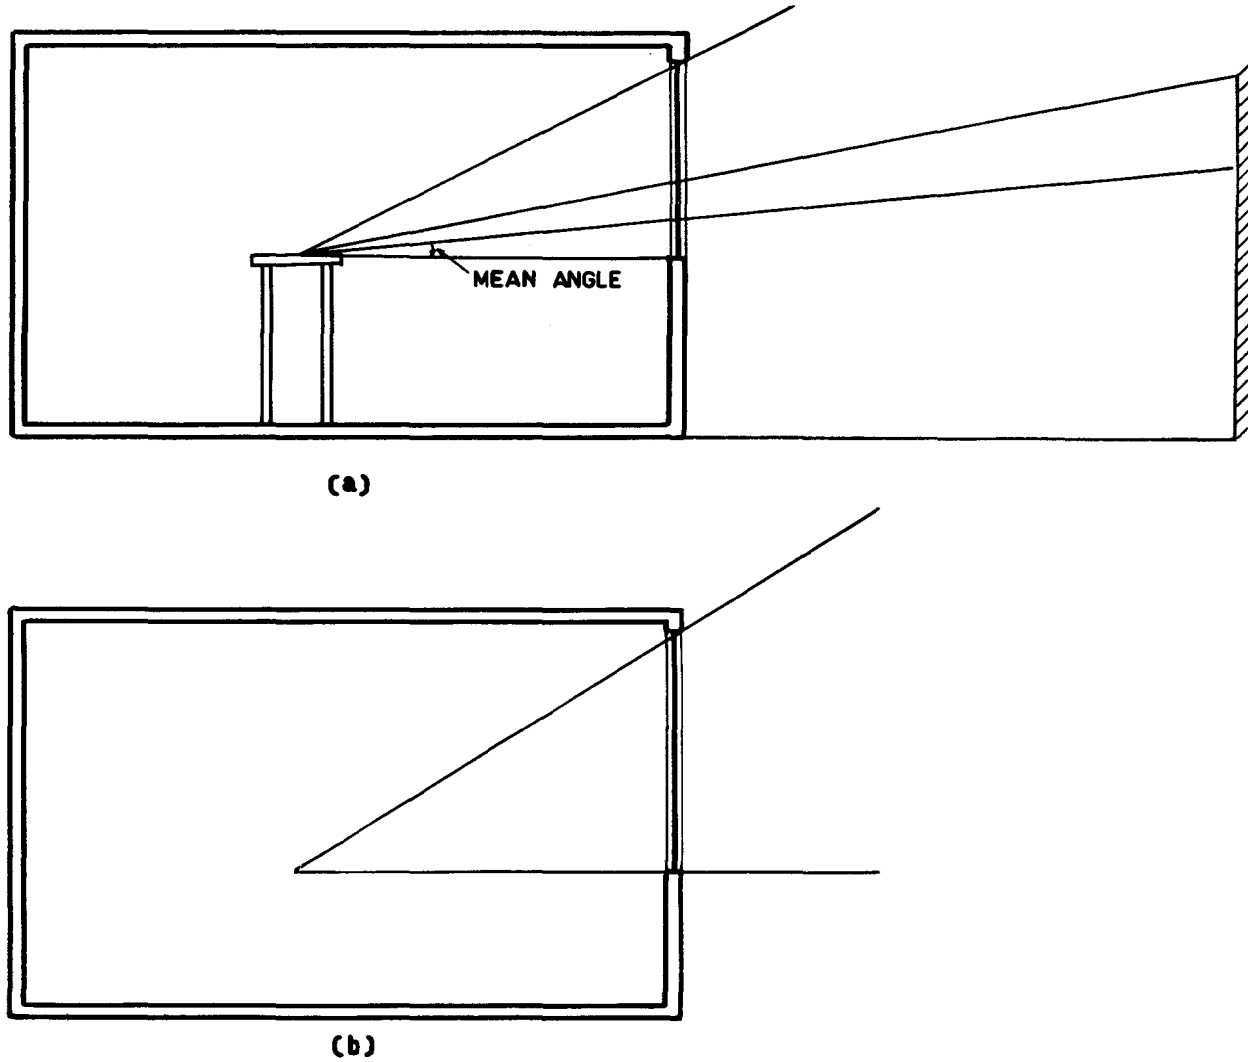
ILLUSTRATION DEPICTING Use of PROTRACTORS ON (a) SECTIONAL ELEVATION AND (b) PLAN IN PRESENCE OF EXTERNAL OBSTRUCTION (EXAMPLE 16)
